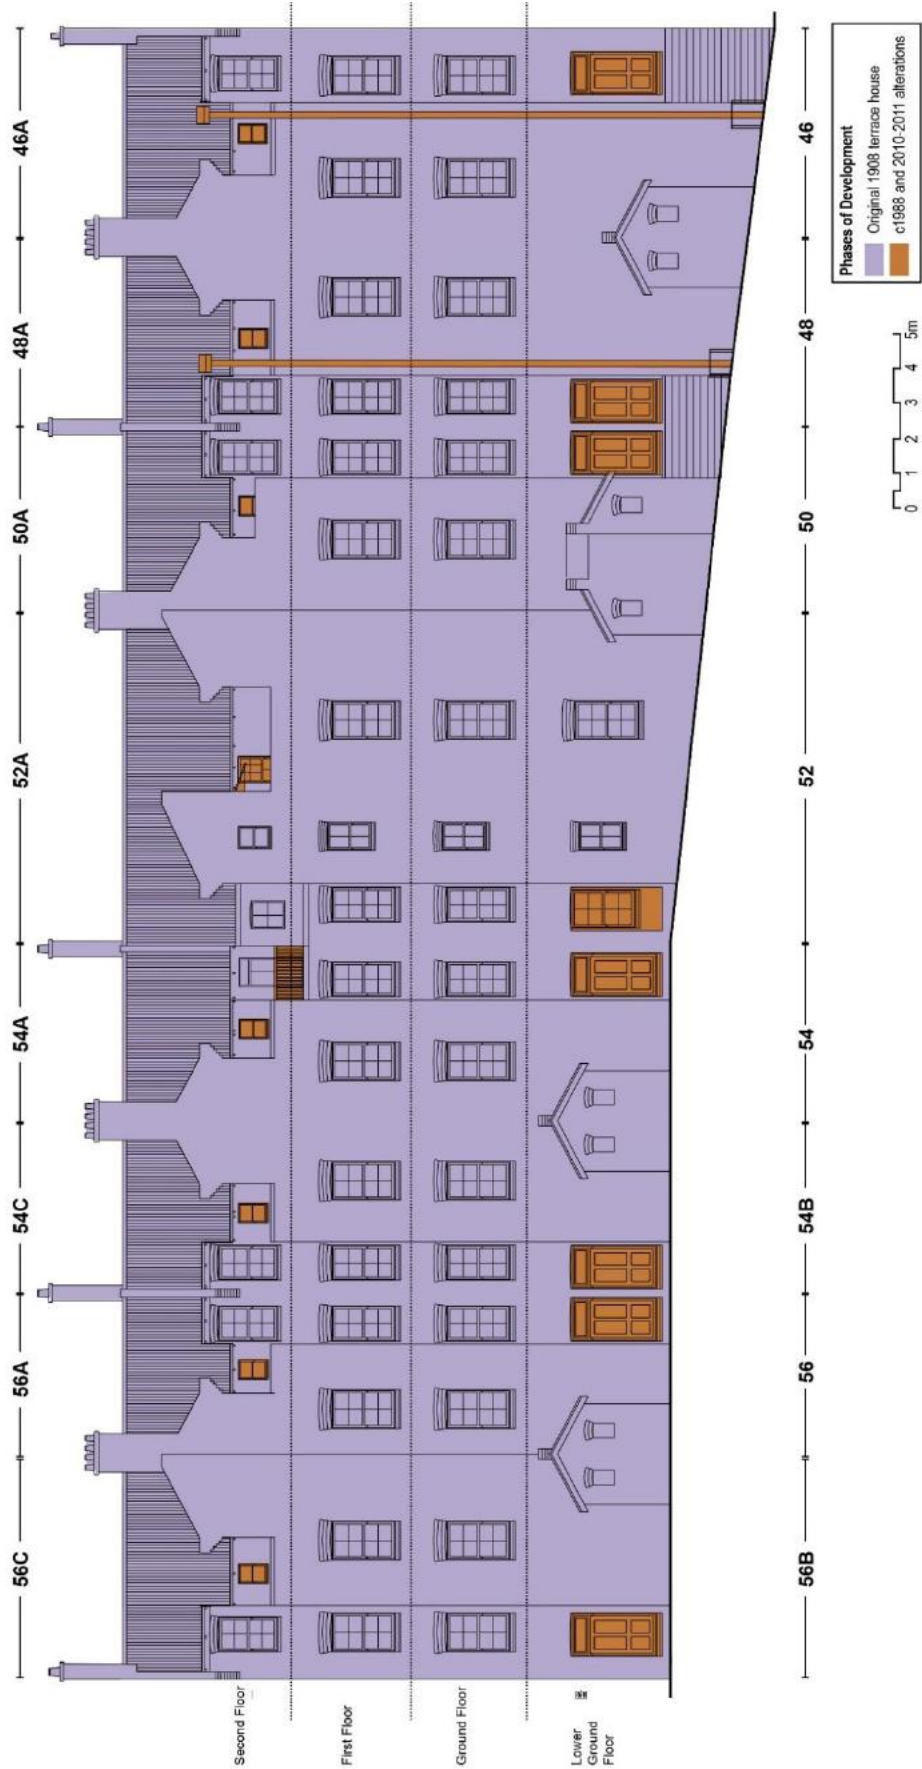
Diagram showing periods of construction—Cambridge Street (east) elevation. (Source: LAHC, with GML overlay 2016)
